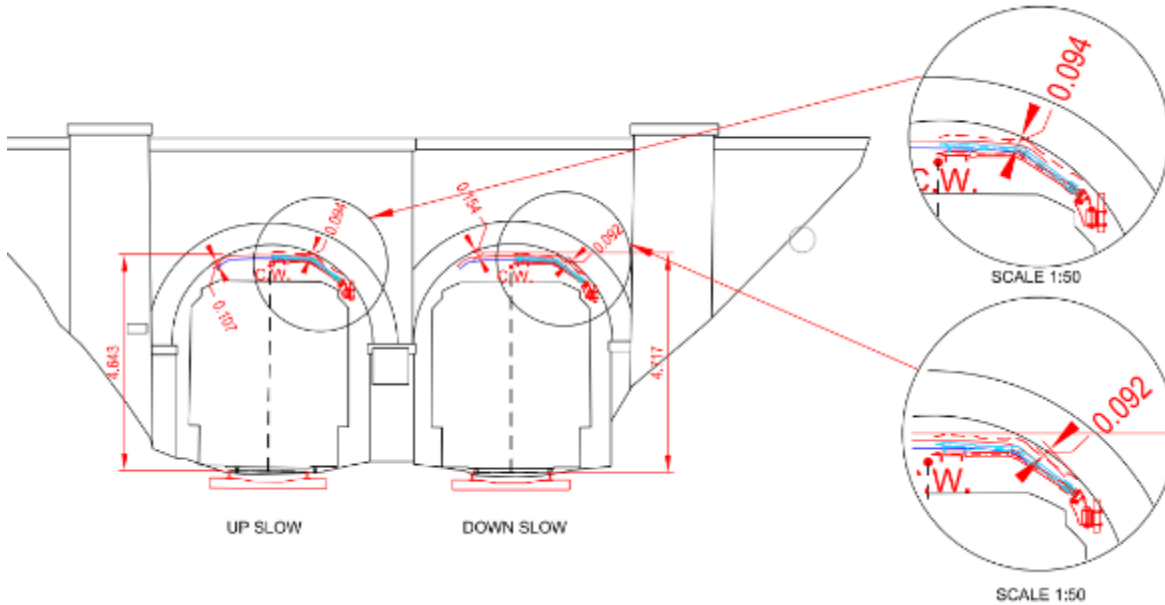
Example Cross Section for Fitted Tunnel Arm OHLE System in Twin Area
